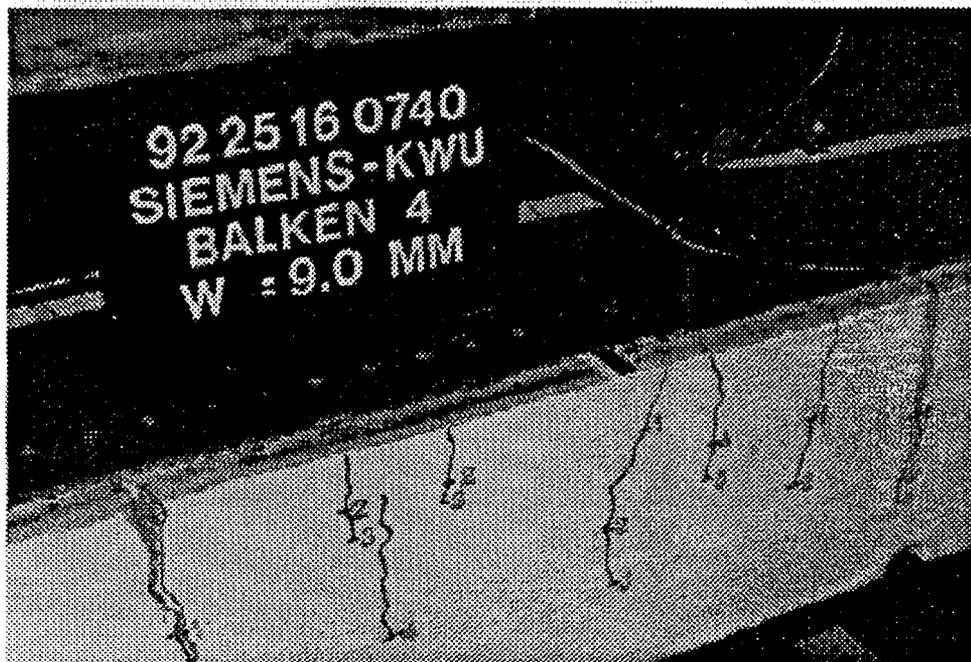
Composite liner during test - crack width of 9 mm after failure
